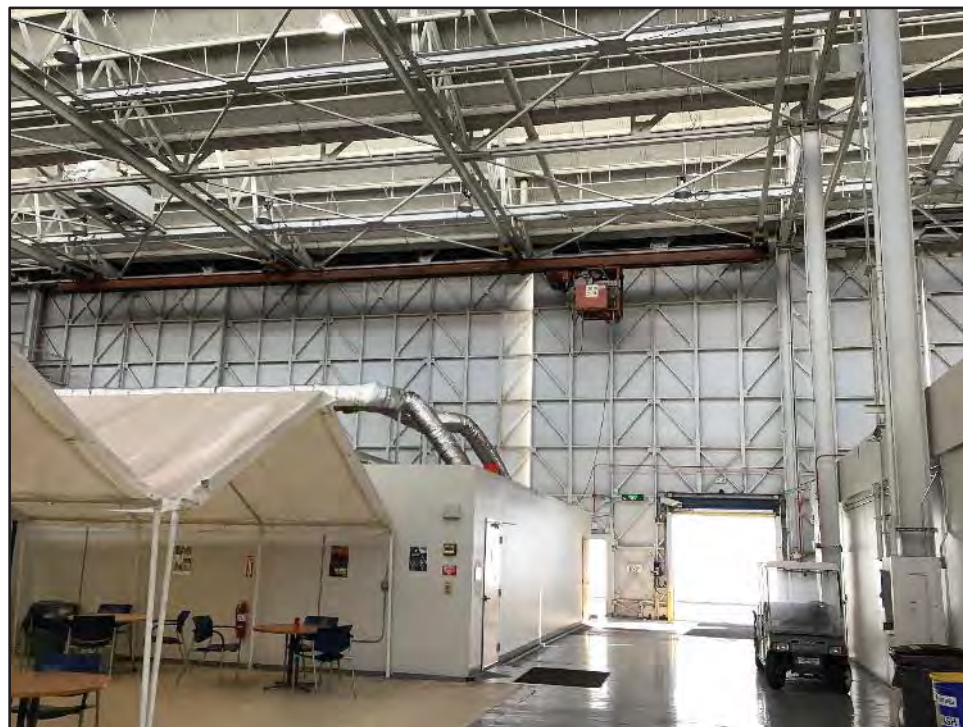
Building 1 Interior, Crew-operated Cab and Hangar-type Doors. View toward the southeast.
